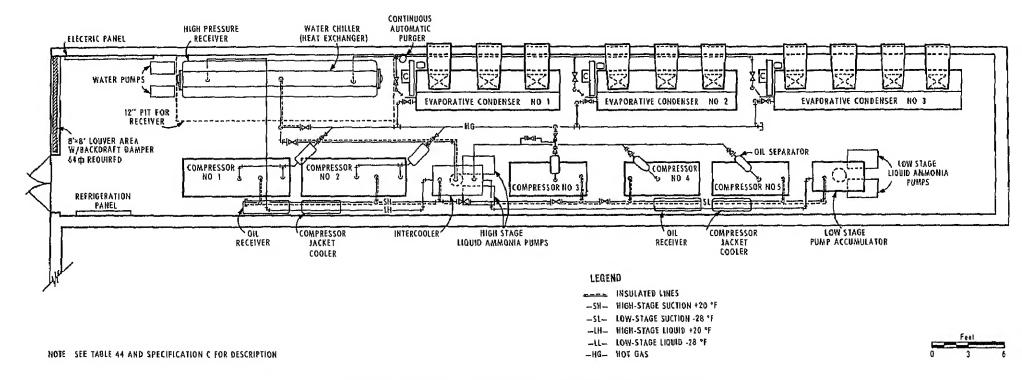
Situation III, Building No. 2, central system equipment room.
